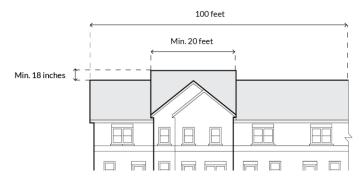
E.2.A: ROOF LINE OFFSET
